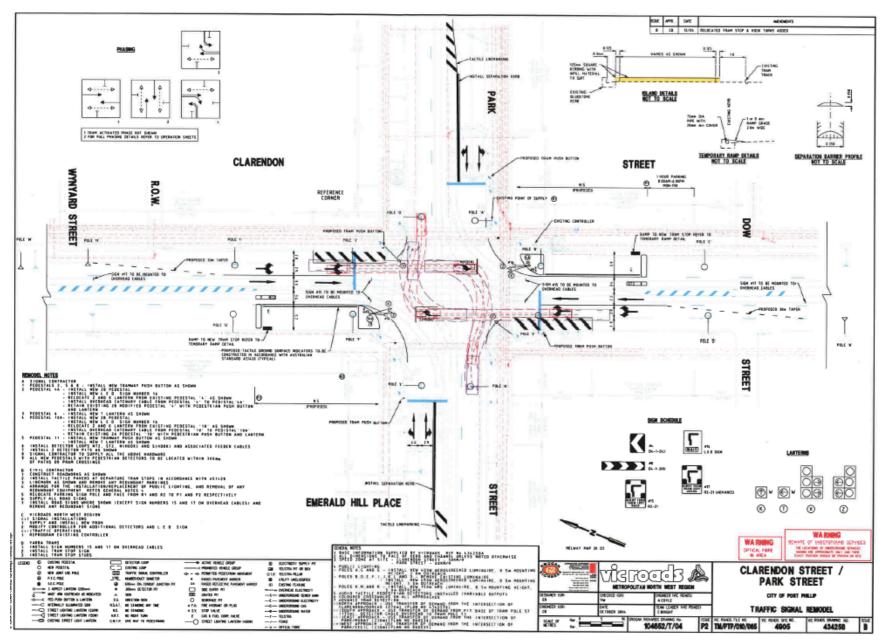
Clarendon Street / Park Street traffic signal design plans Source: VicRoads (2004)
